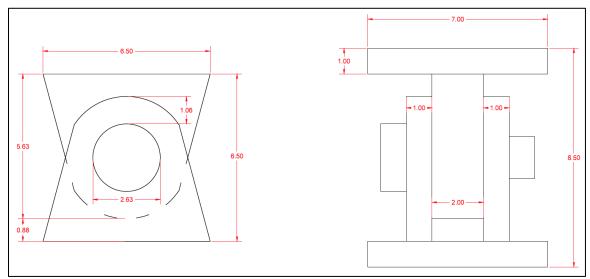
Frame Connection of Pedestrian Bridge with Column (2 of 2)
